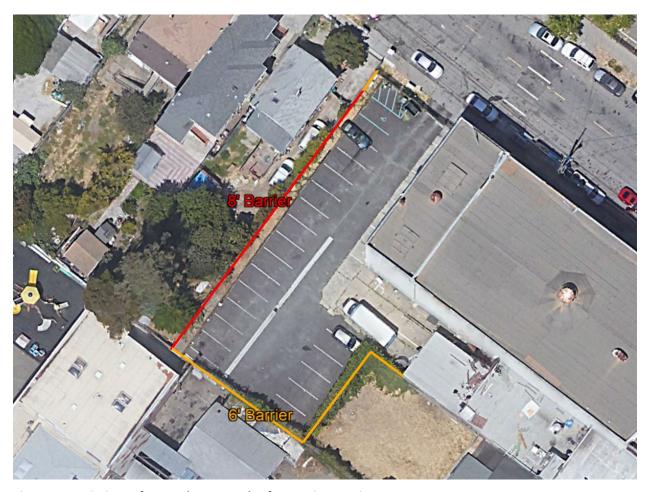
Existing 6-foot and Proposed 8-foot Noise Barriers
